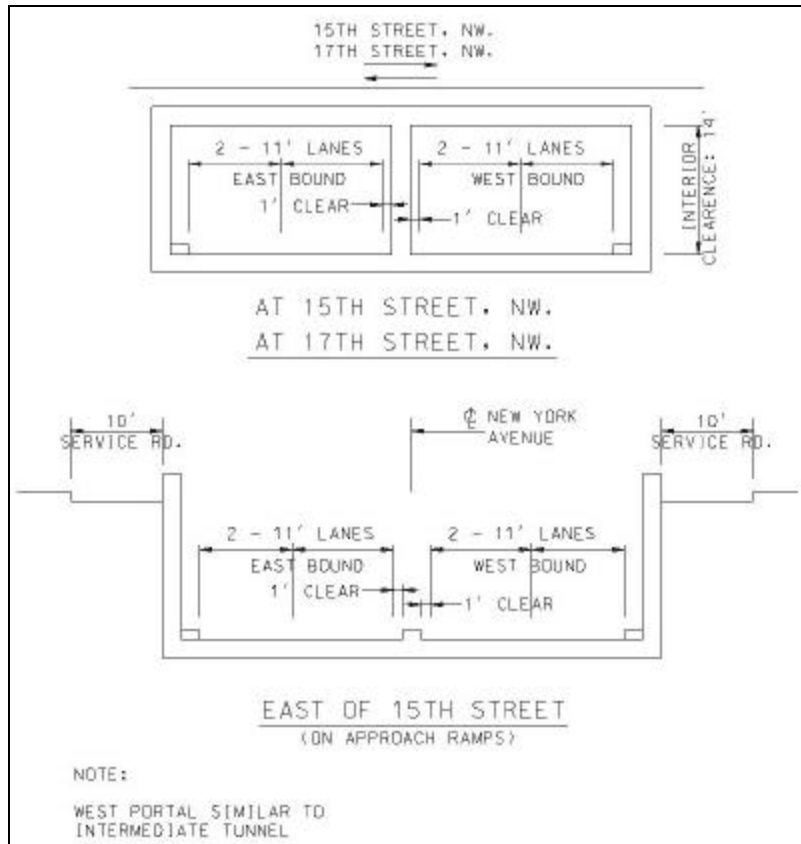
Preliminary Long Tunnel Cross-Sections
